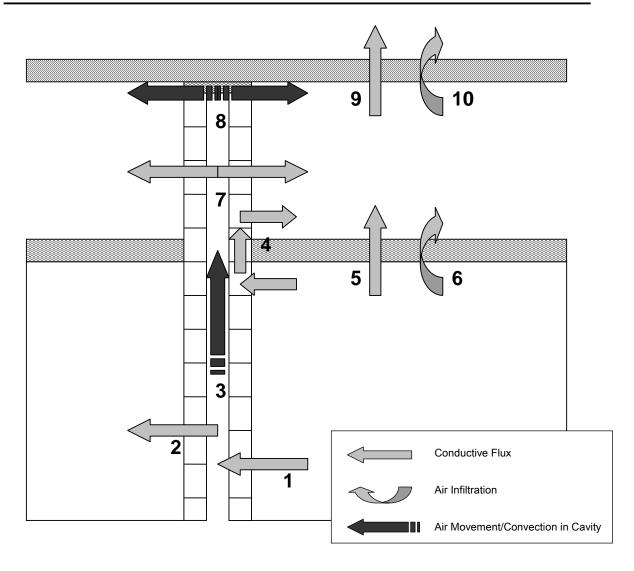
Schematic of Major Heat Flows into Attic of Dwelling with Masonry Cavity Party Wall
